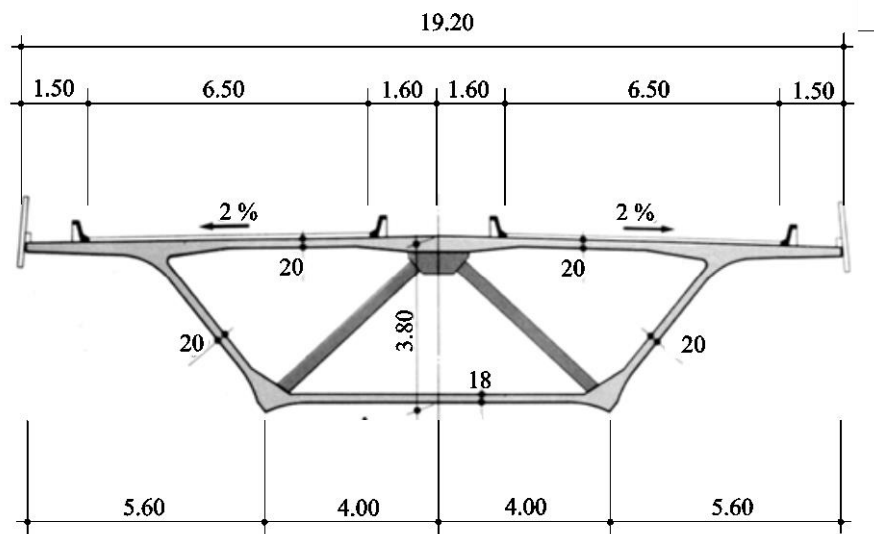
Cross-section of the Brotonne Bridge [Leonhardt 1987]
